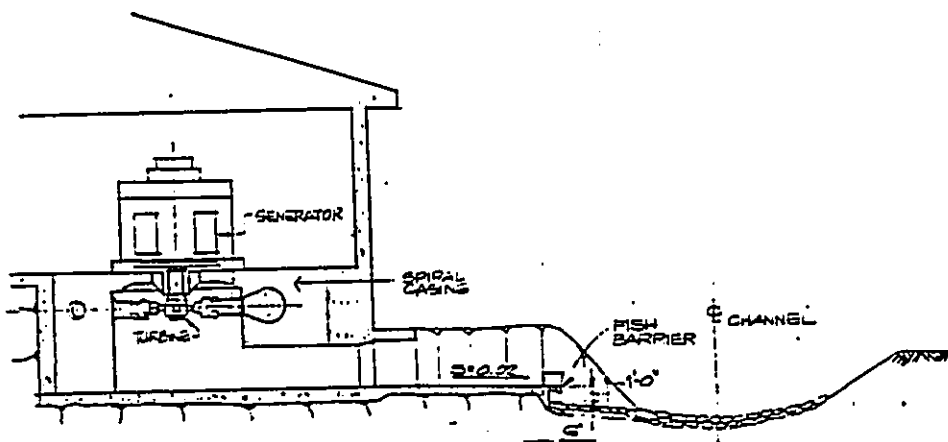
The tailrace plan and section for the Upper Wailua project.
